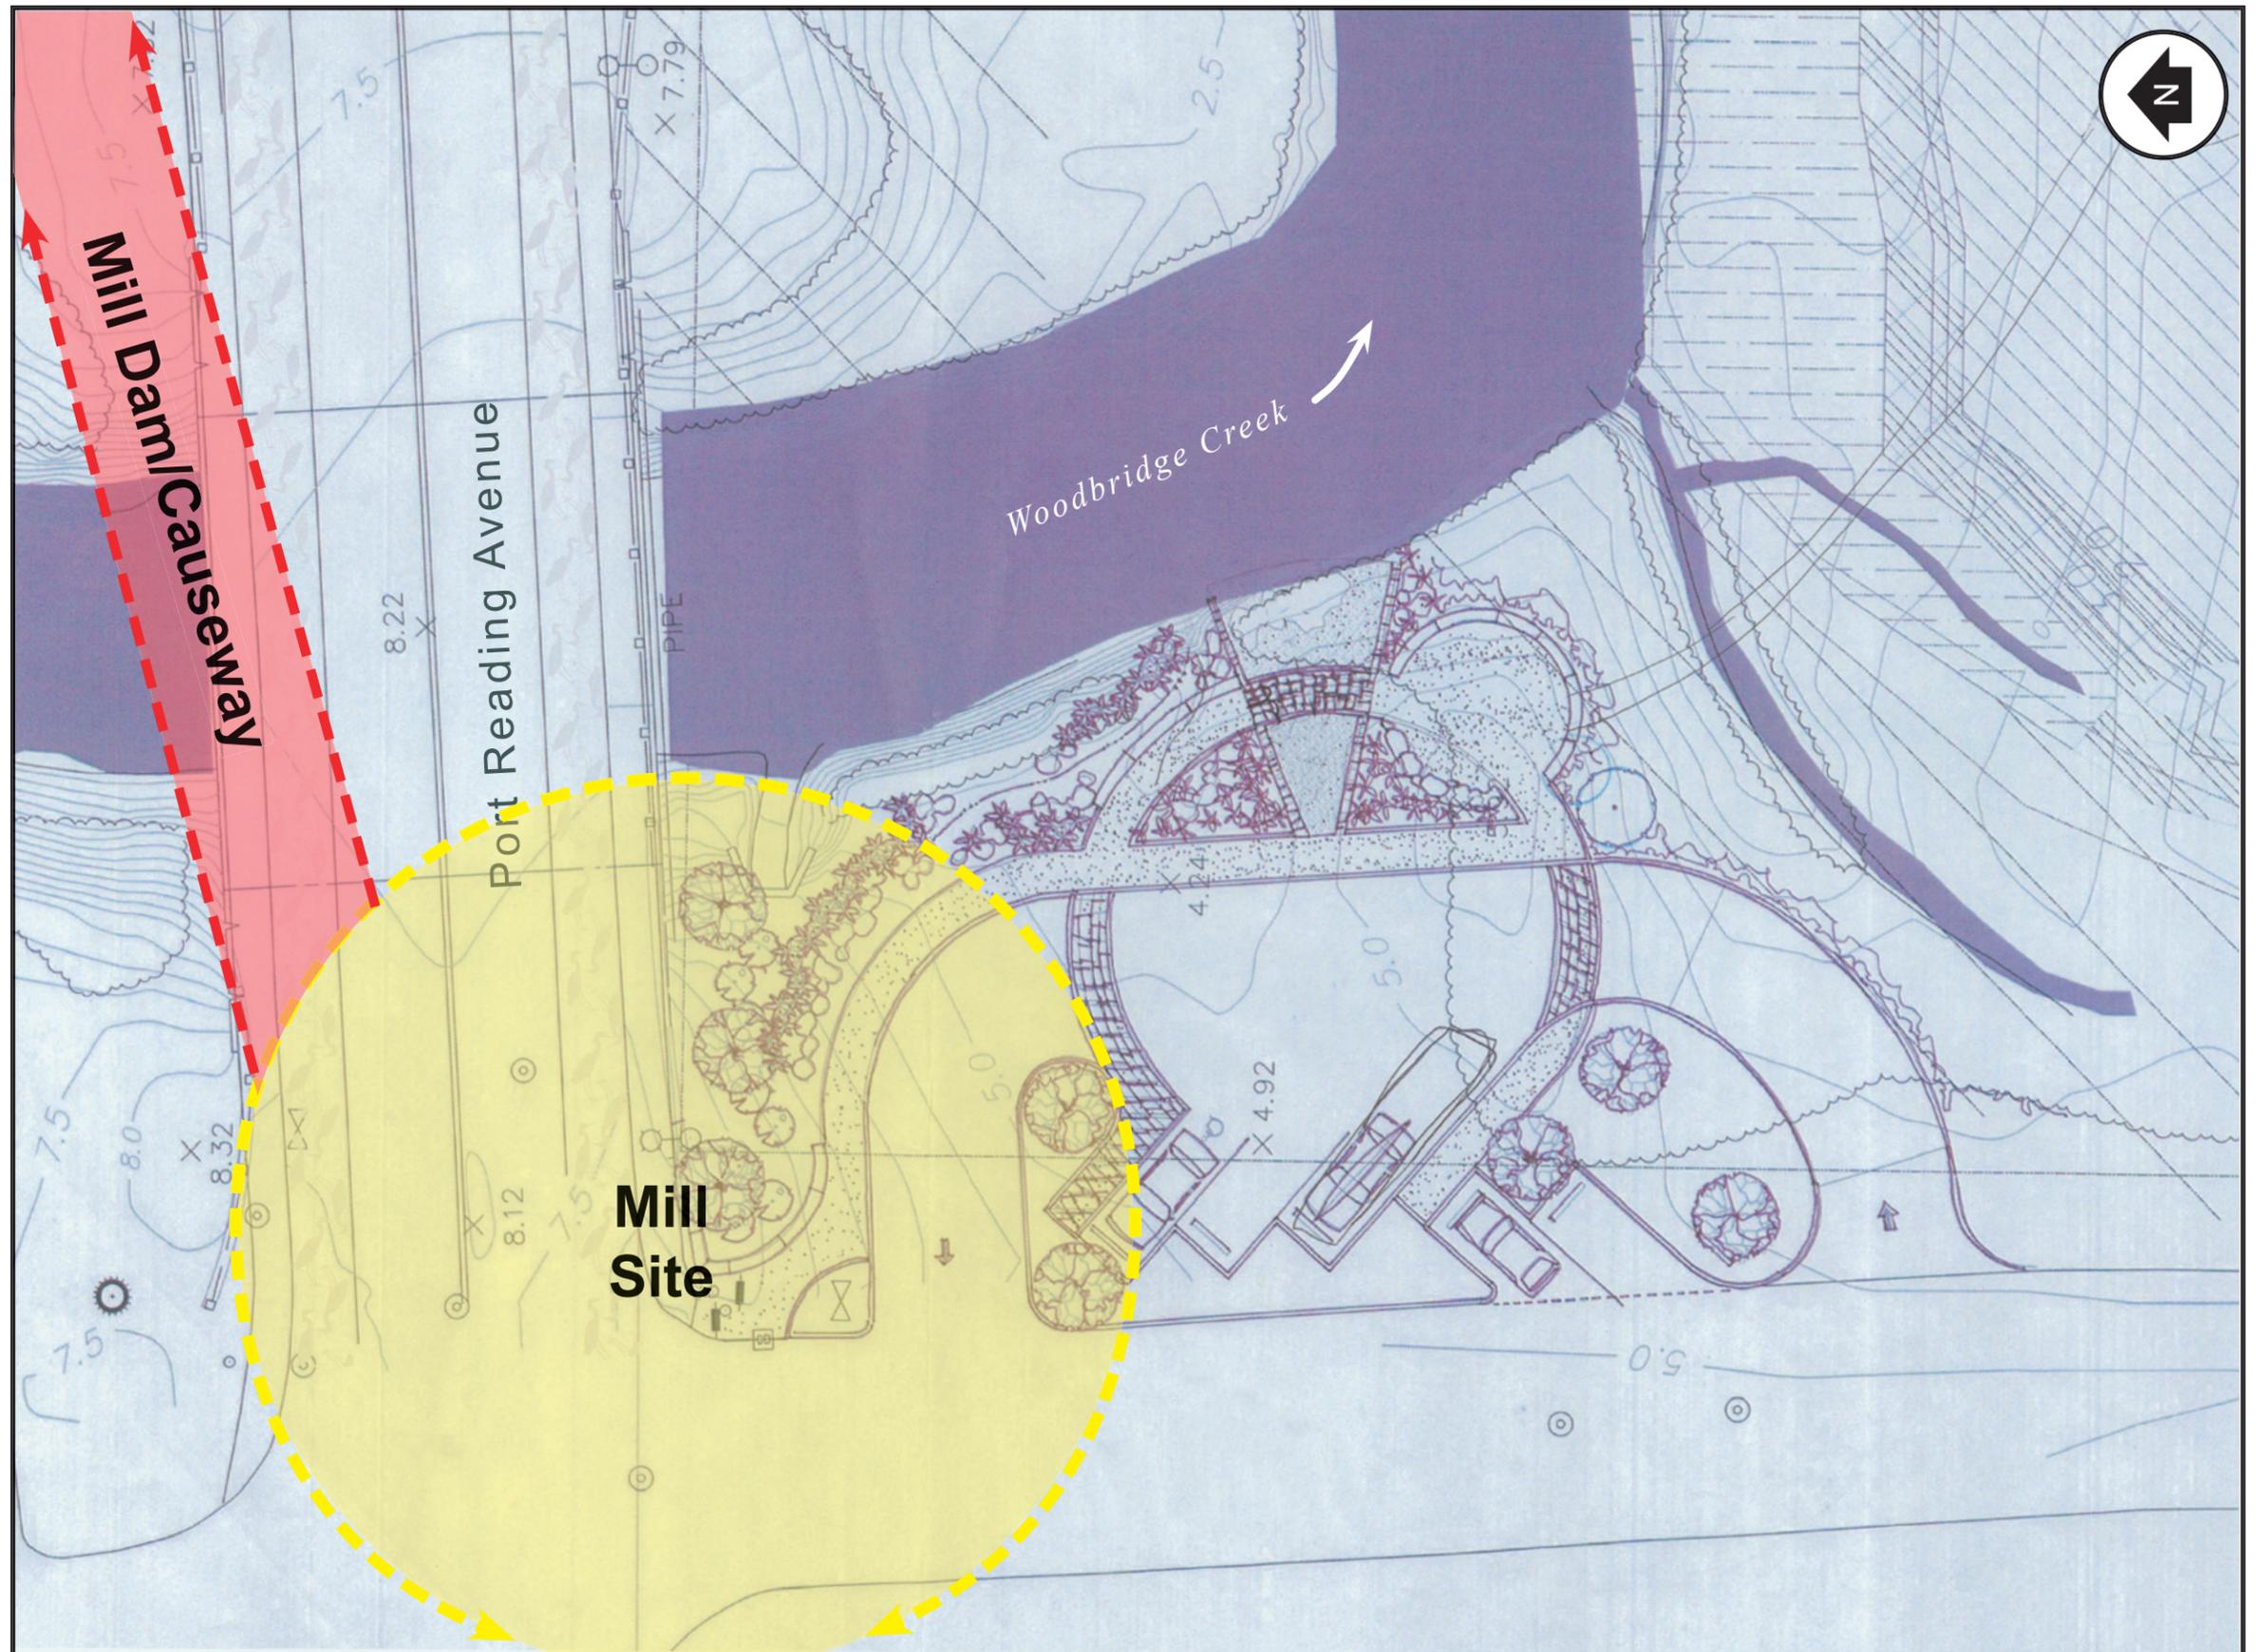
Conceptual Design of Proposed Public Access Area South of Port Reading Avenue and West of Woodbridge Creek in Relation to Probable Site of Dunham's Mill and Mill Dam/Causeway. Scale: 1 inch= 18 feet (approximately). (Source: Louis Berger and Associates, Inc. 2005).
